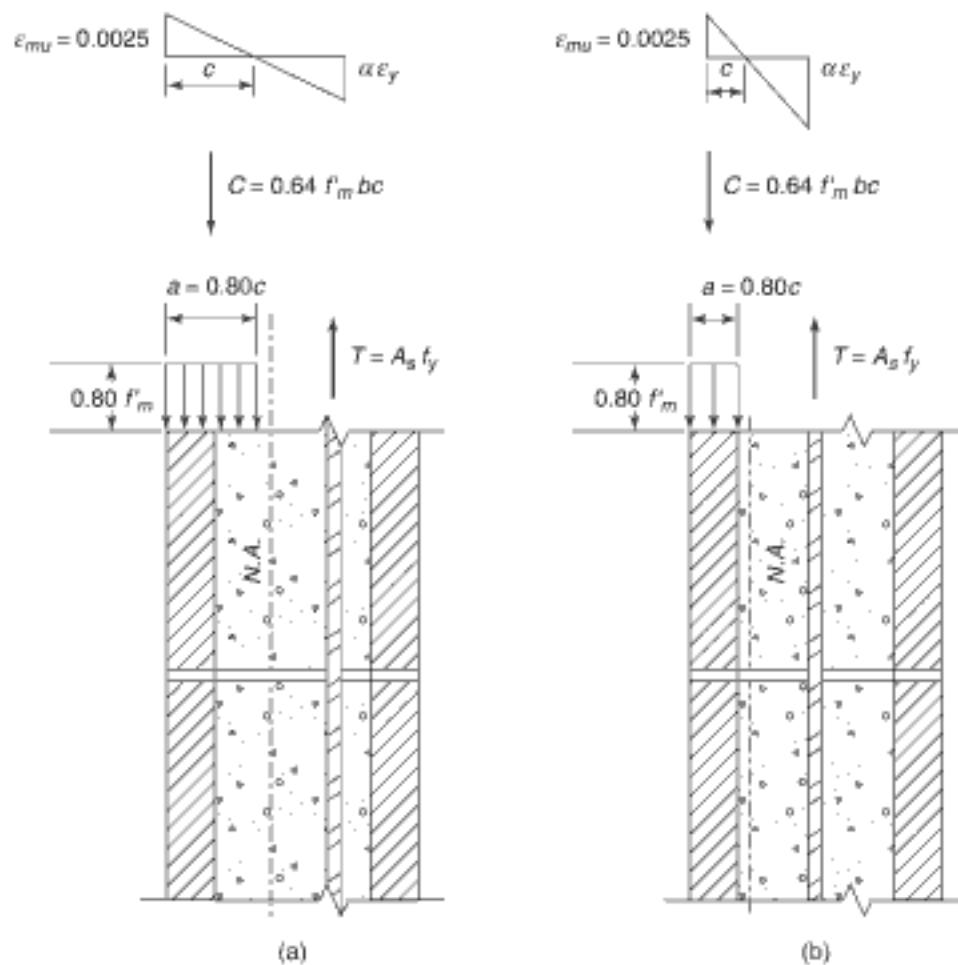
Cross-Sectional Details of Masonry Reinforced Wall (Ref. 17.1).
